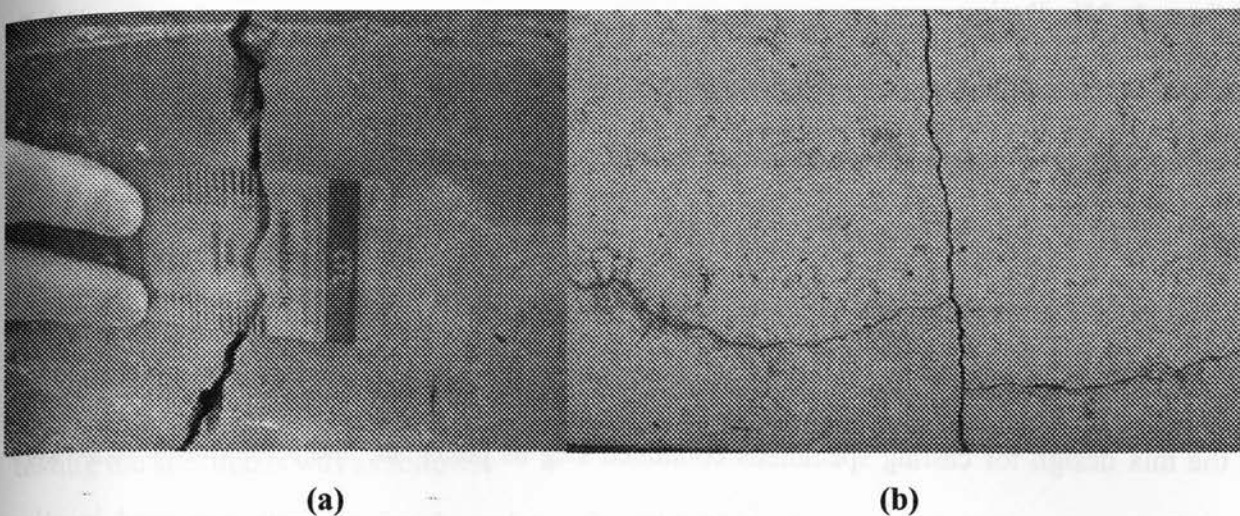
(a) Vertical crack width (b) Horizontal crack formation from the vertical crack on the south west side of the barrier wall
